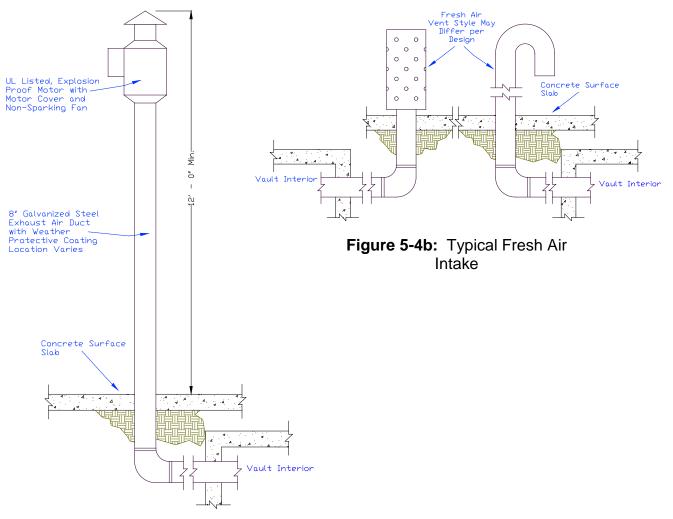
Sectional Views of Typical Vaulted AST (Ventilation)
